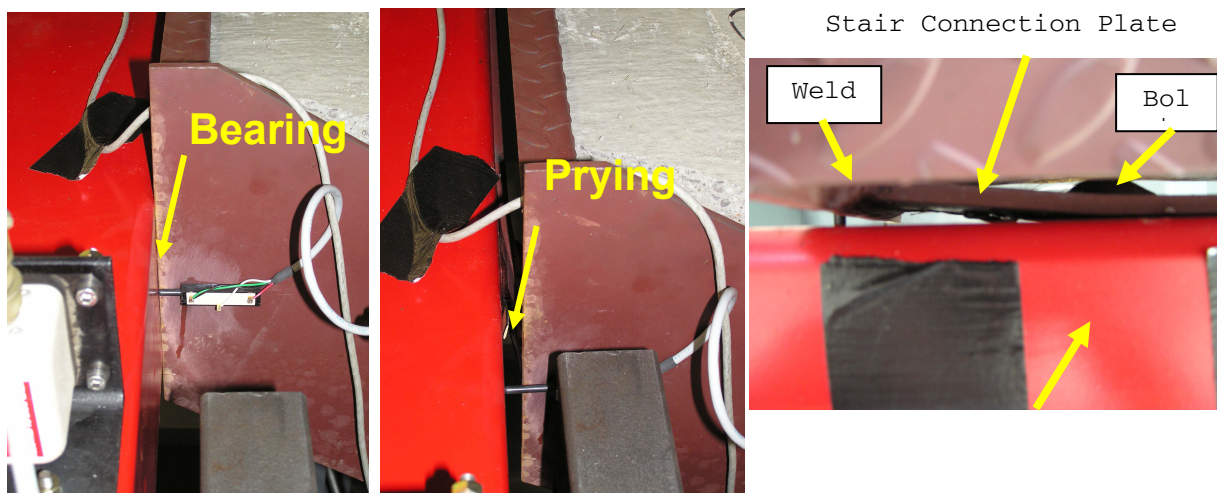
Alternating top landing connection bearing and prying during transverse loading.
